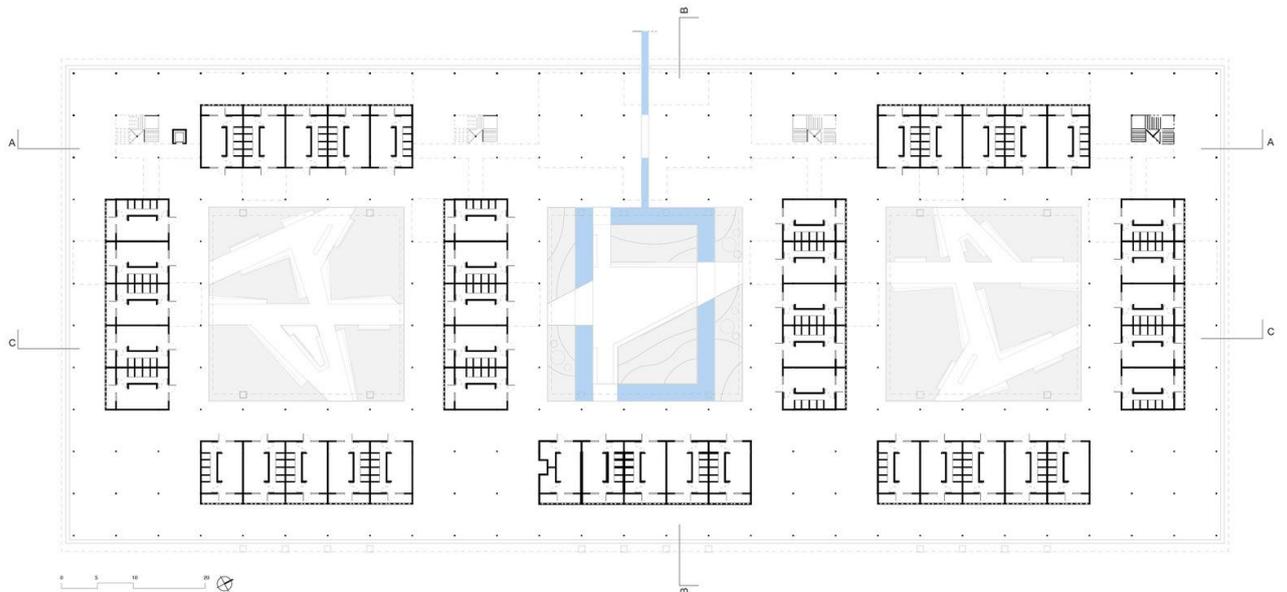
Ground floor plan (Leonardo Finotti - www.archdaily.com)
